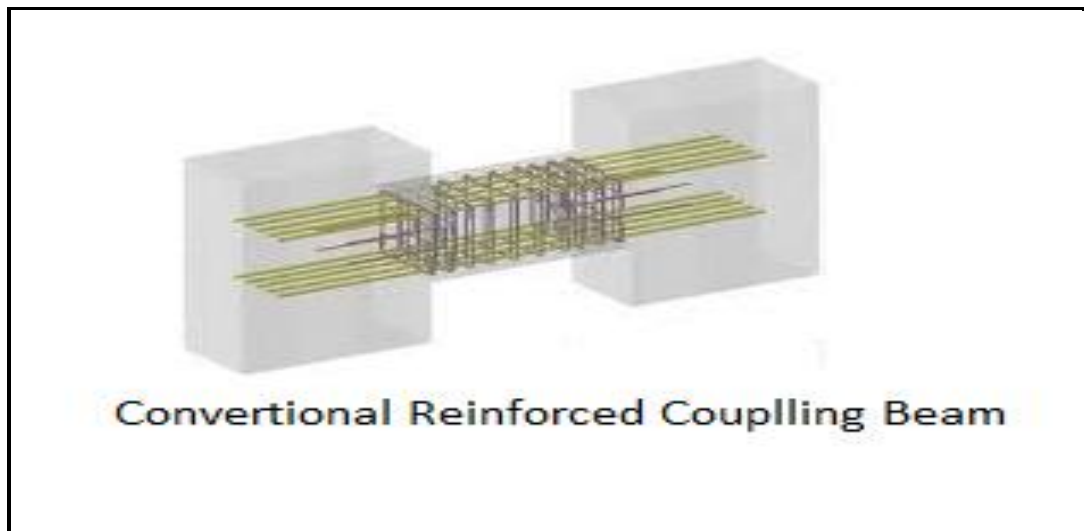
Details of a Beam in Coupled Shear Wall System (URL12)
